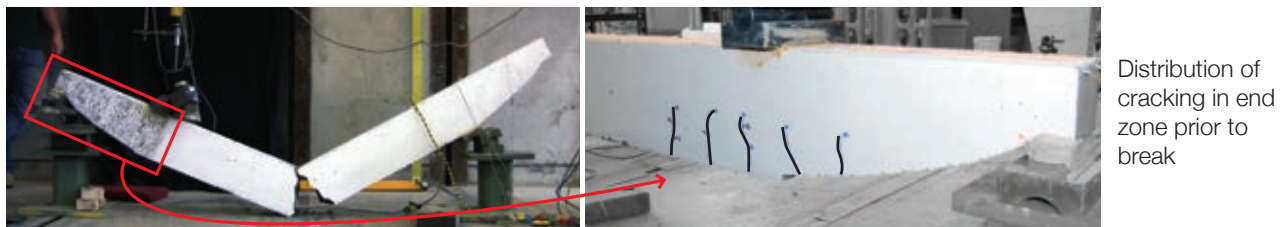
Bond failure in Beam 9\_2\_CFP (l) and crack pattern prior to failure (r).
